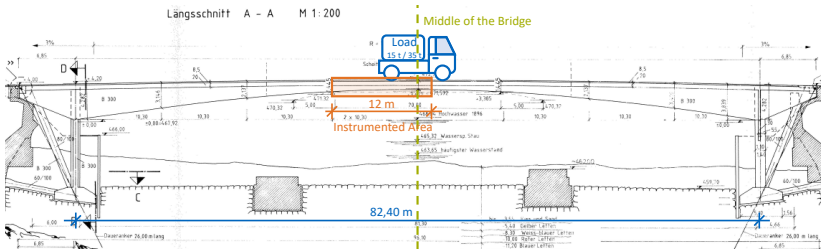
Overview of the instrumented bridge (adapted from [134]).
